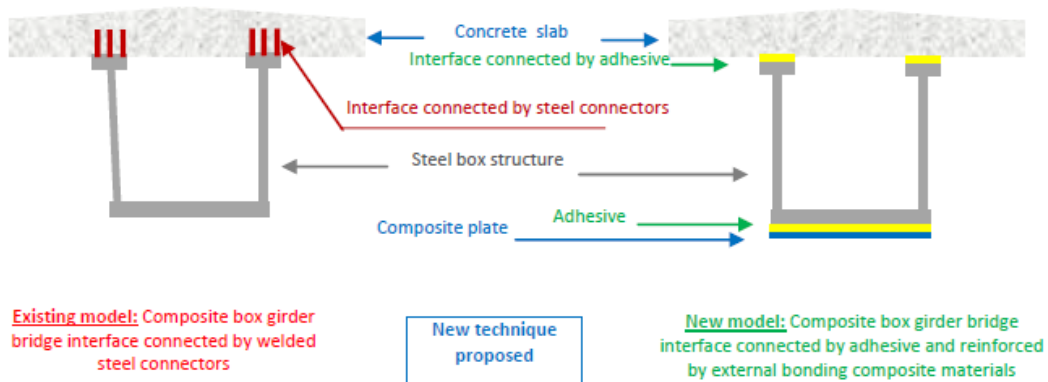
Cross-section of a steel-concrete composite box girder deck with 90° web: mechanical connection (existing model) vs. adhesive bonding (proposed)
